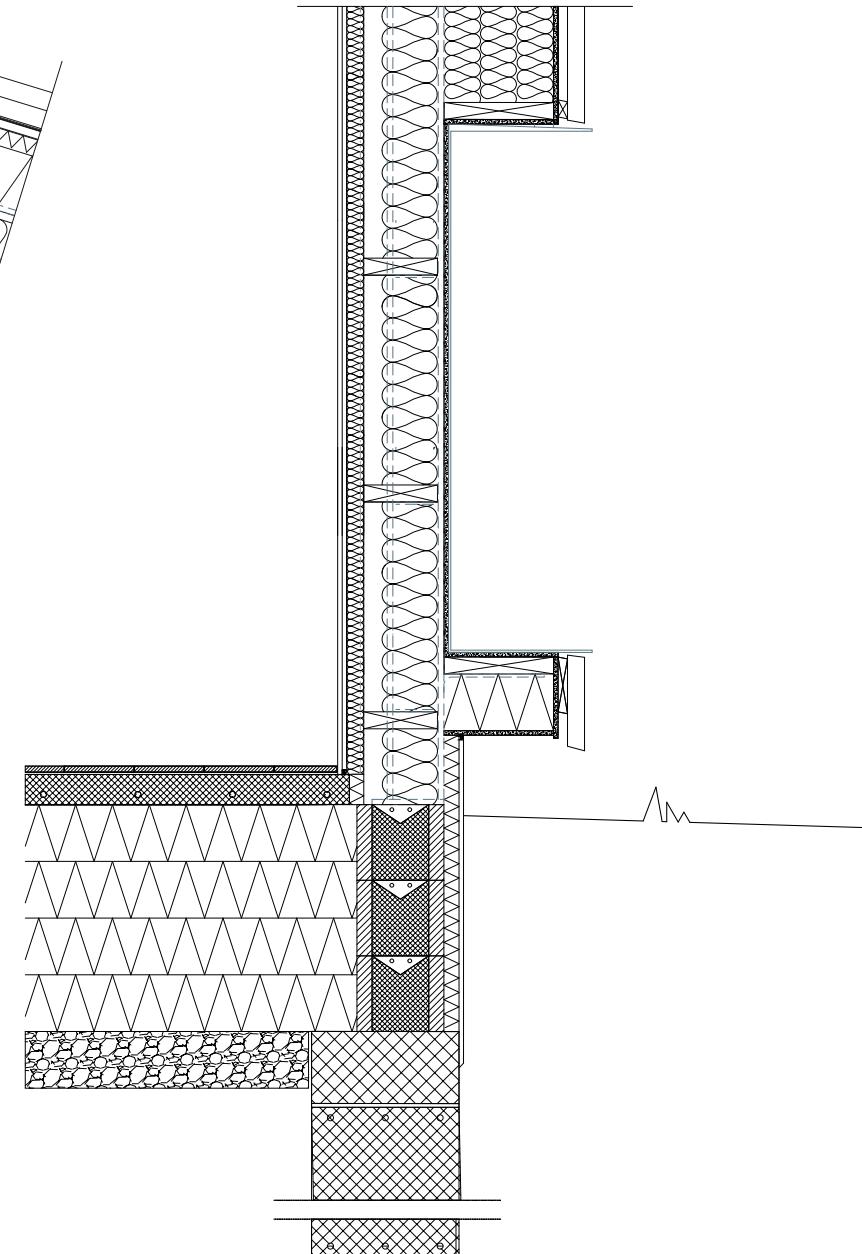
Technical drawing of exterior wall and integrated bench and base 1: 20
